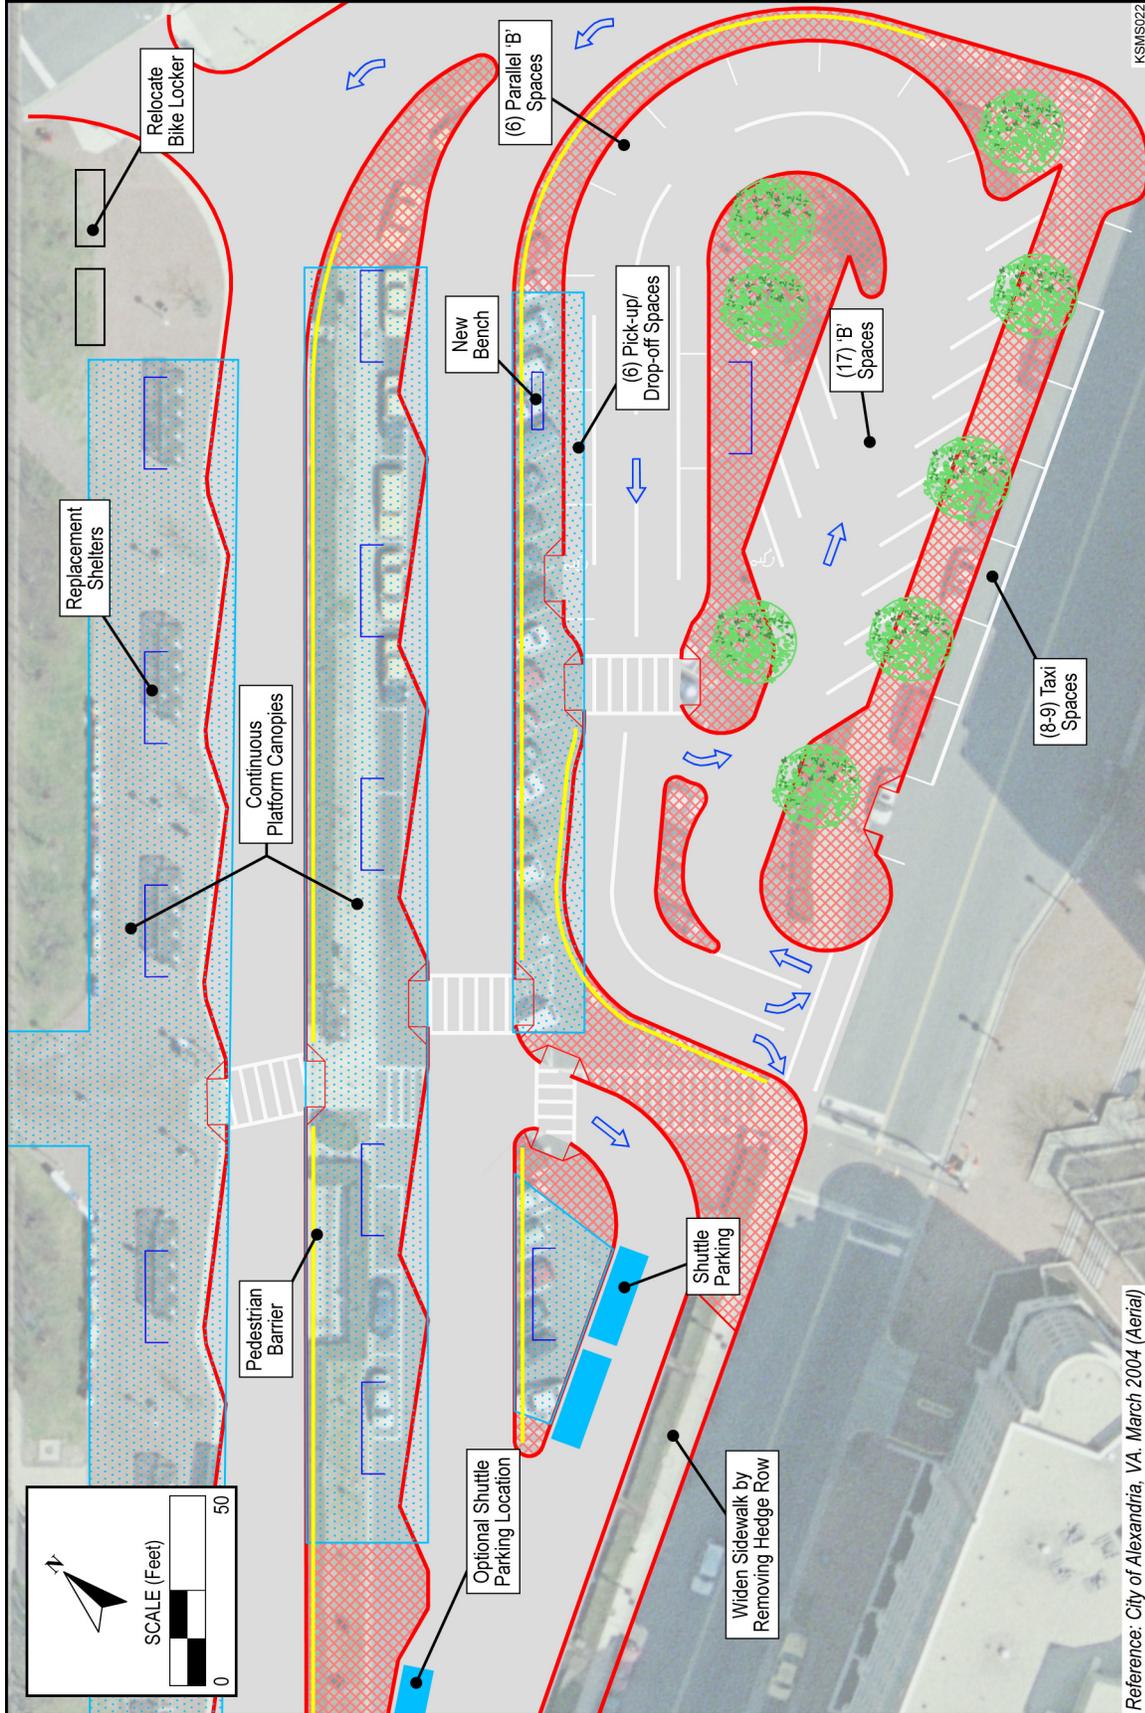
WMATA Proposed Reconfigured Site Facilities – Alternative B
